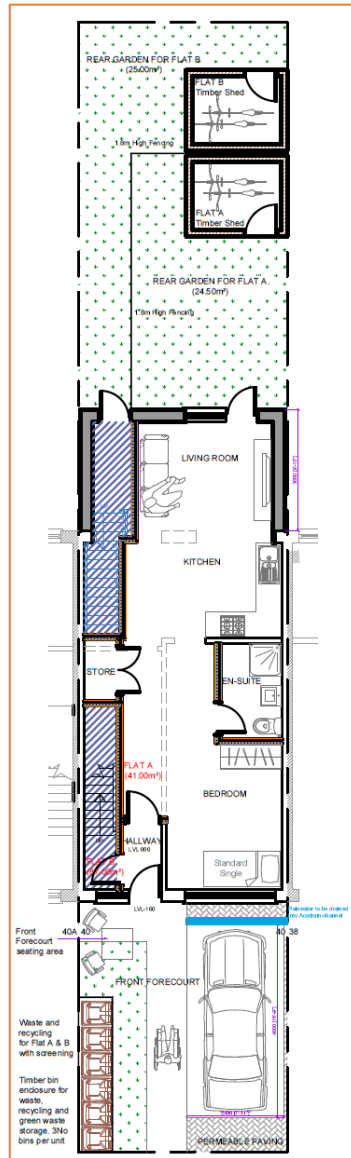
Proposed Site Layout Plan (Source: DS3 Studios)
